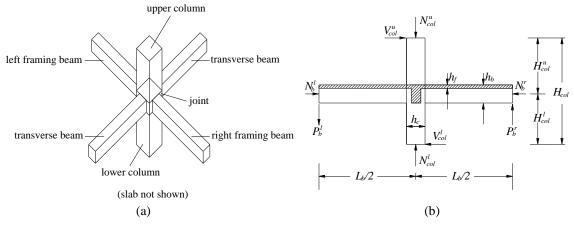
Illustration of an interior beam-column connection: (a) three dimensional geometry; (b) under forward lateral loading
